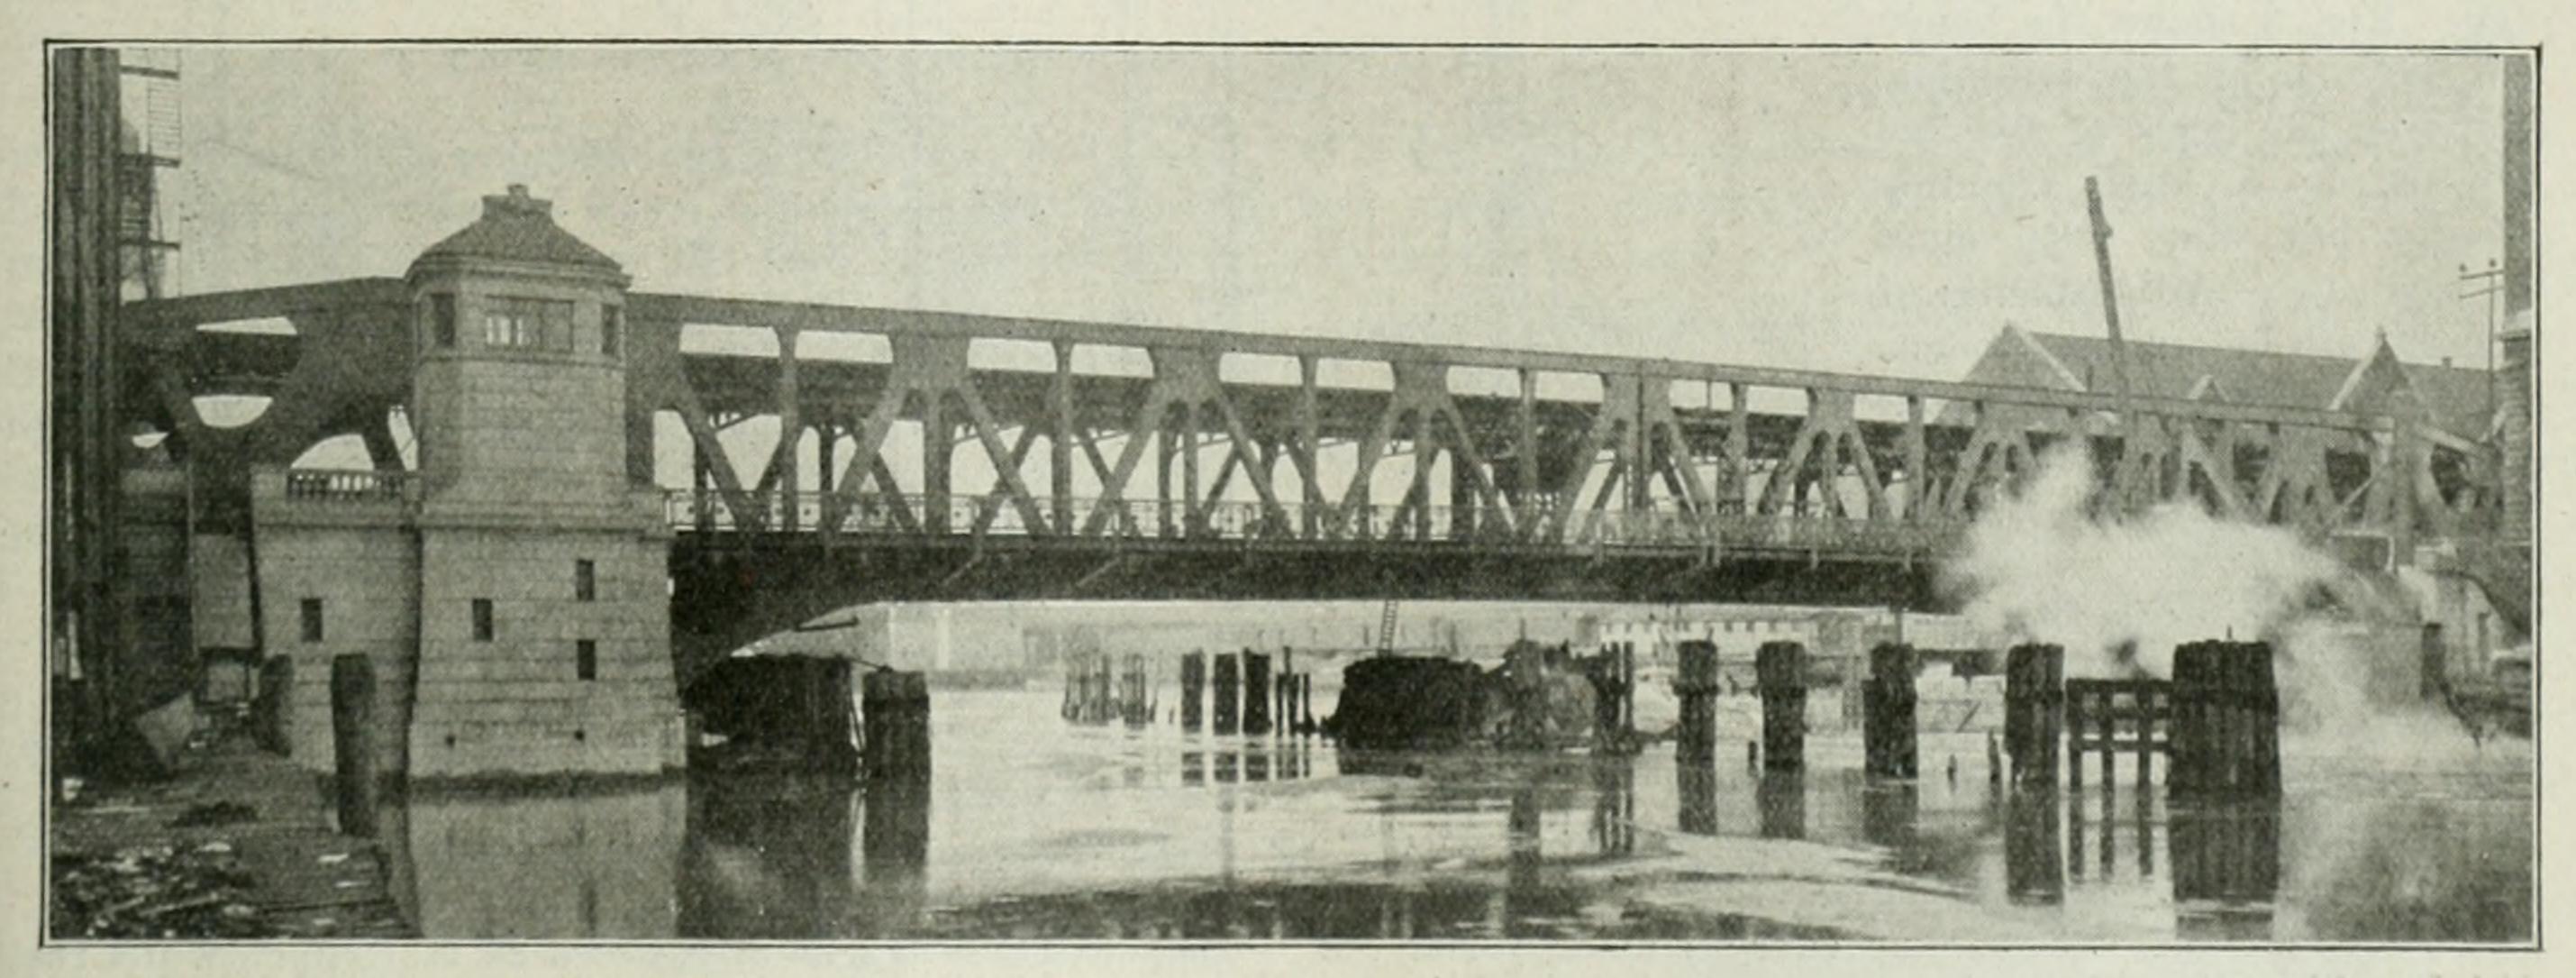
DOUBLE-DECK 268-FT. BASCULE BRIDGE FOR STREET AND ELEVATED RAILWAY AT WELLS ST., CHICAGO
